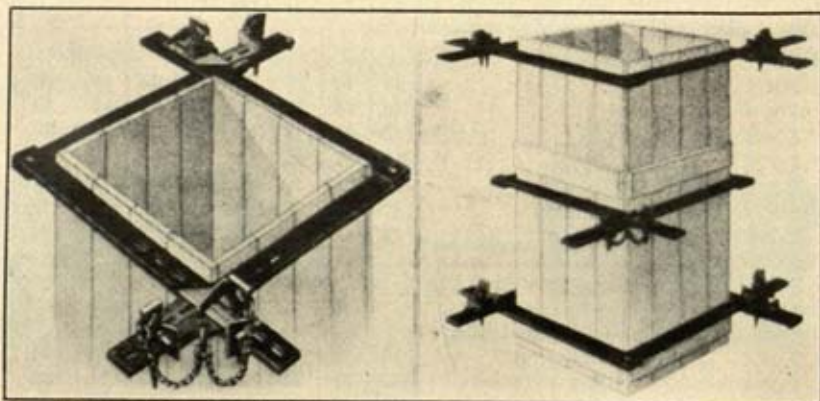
Wood forms and adjustable clamps for concrete columns. (Symons Clamp and Mfg. Co.)
